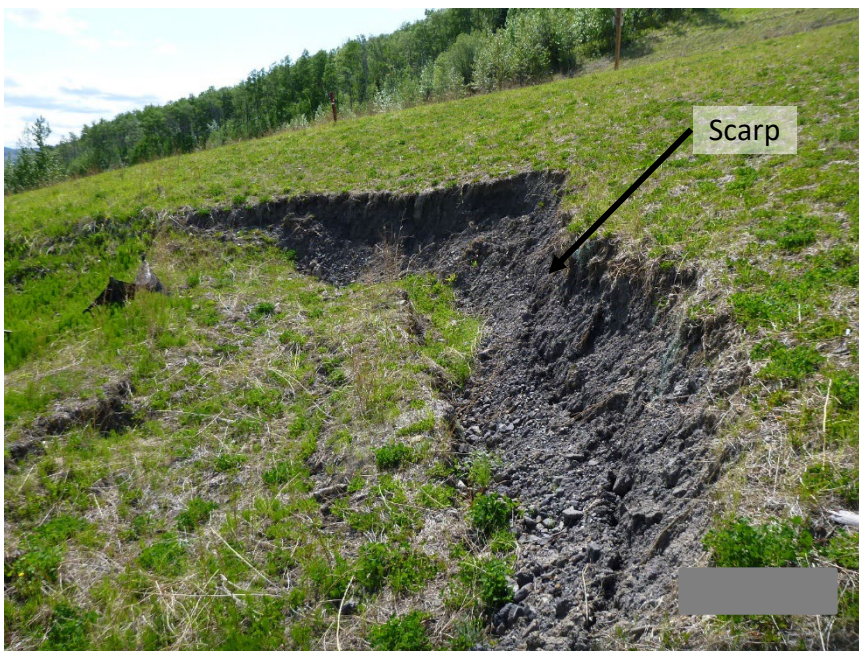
North pile wall on east (downslope) side of Hwy 40:36. Photo taken June 2, 2025, facing north.
